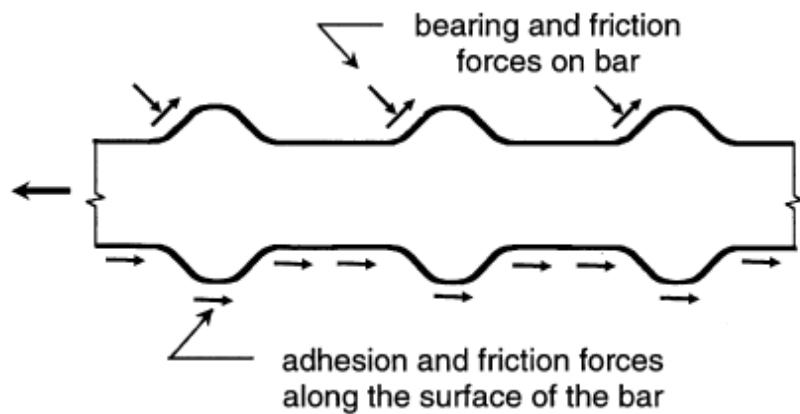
Bond forces acting on steel embedded in concrete (ACI 408 2003)
